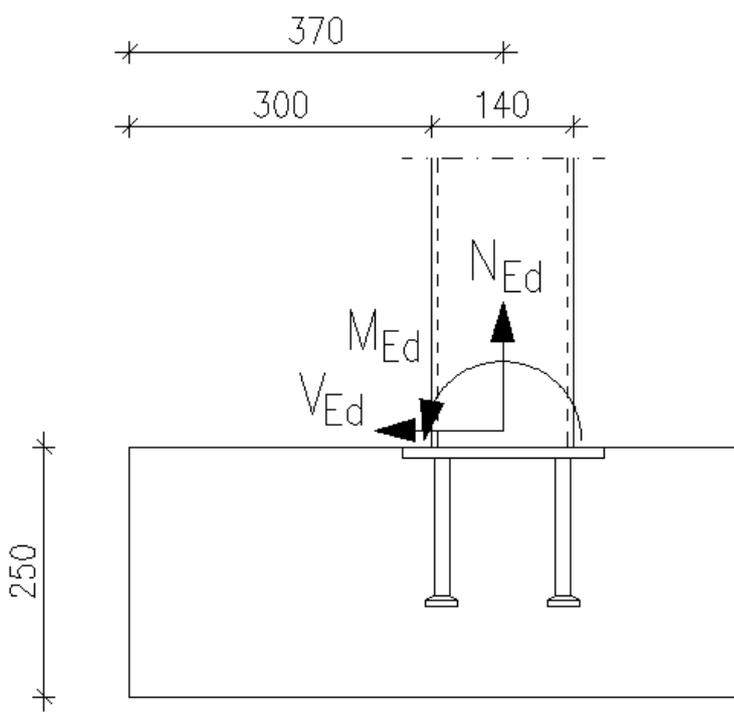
Design example for SBKL fastening plate without additional reinforcement, dimensions of fastening plate.
